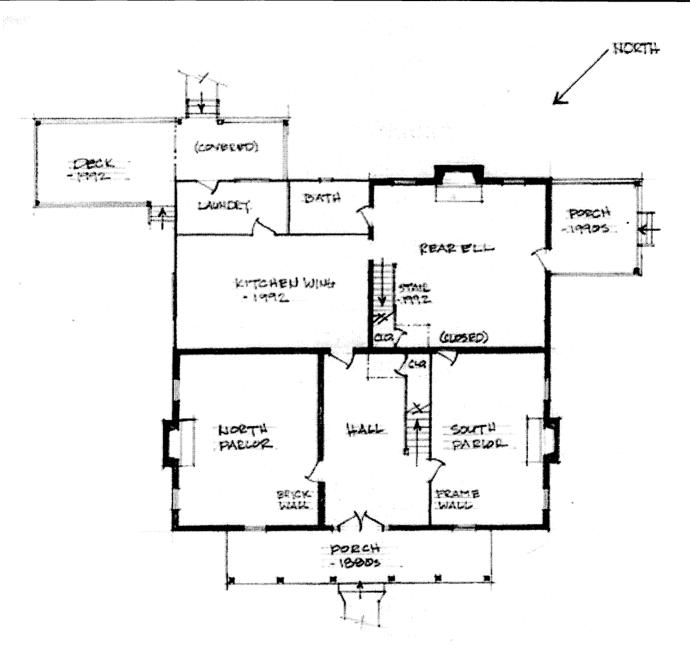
Dr. Benjamin Franklin Smith House, first floor plan, 1850-1890 (R. Jones). Scale: 1"=1'.
